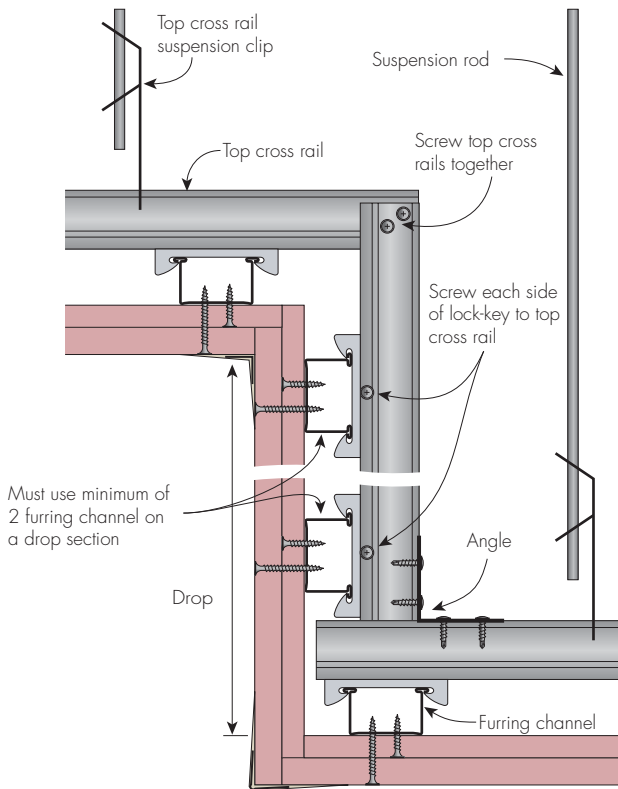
Suspended Ceiling Bulkhead – Elevation
